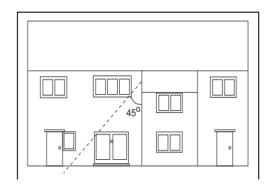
Stage 2 Elevation - 45° guideline assessment. In this example the affected patio door is within the 45° angle on both plan (fig 1) and elevation, so a significant reduction of light is likely.
